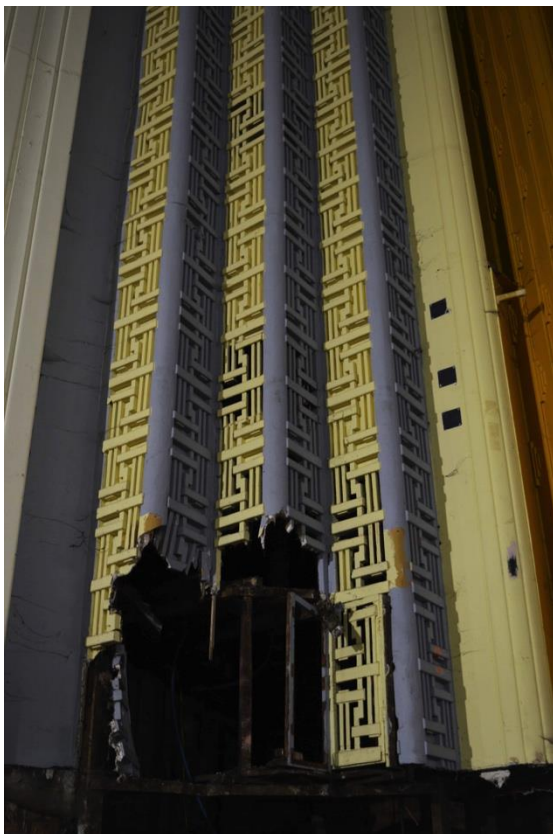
Ground floor, auditorium, detail of Greek key design on proscenium arch, facing north-west (7533_0040)
